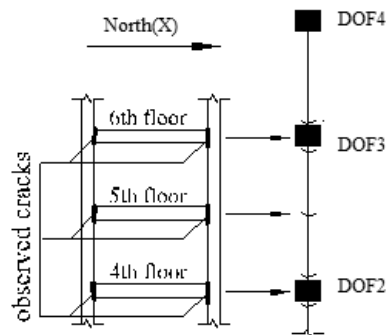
Observed vertical cracks at the beam-column connection at floors 4, 5 and 6 after the SHW2 event.
